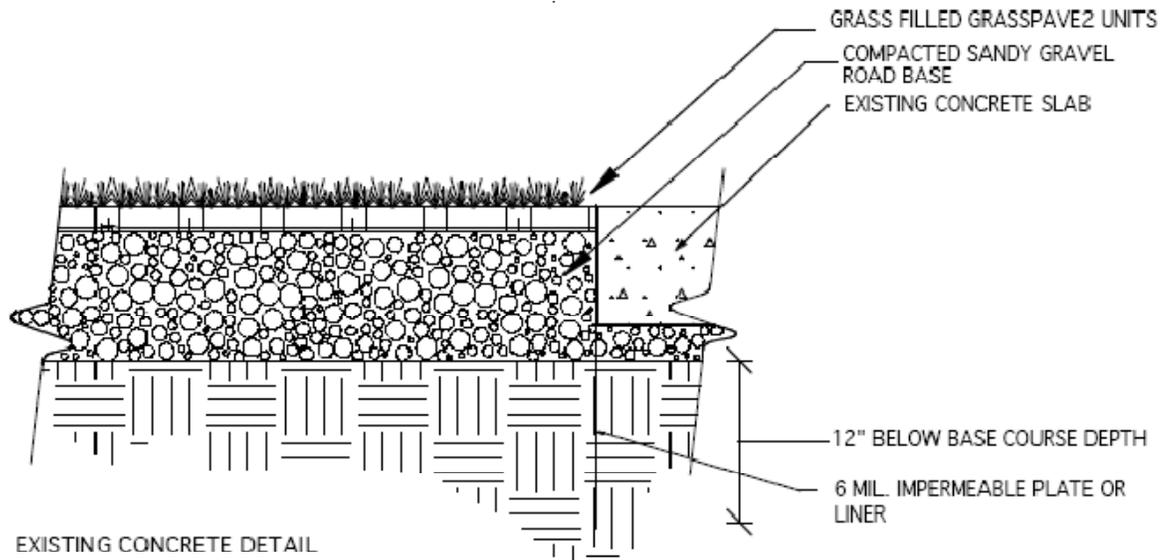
Typical section for cellular reinforced grass pavement adjacent to conventional impervious pavement. Source: NA
